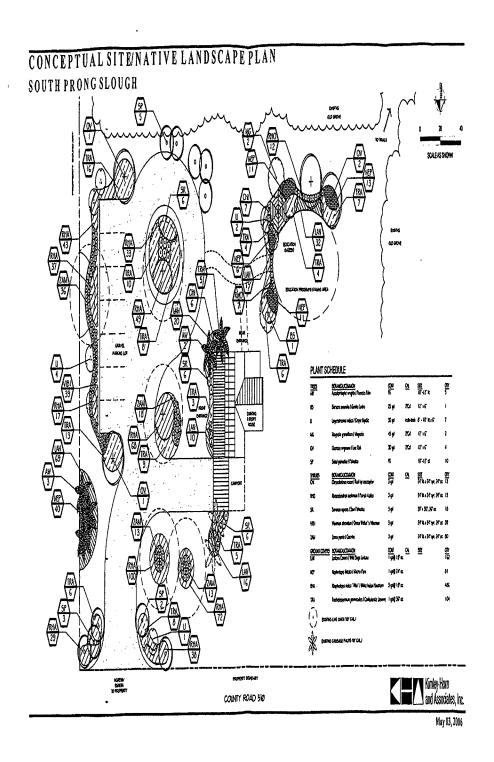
Exhibit G. Conceptual Landscape Plan (Stough Parcel of the SPP).
